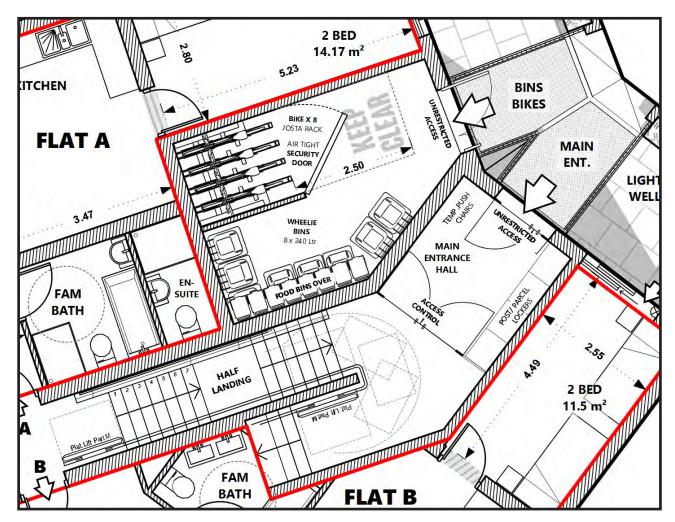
Ground floor plan detail showing: Main entrance lobby with security doors, parcel boxes. Service Entrance: to Bin and Josta 8 x Bike Rack.
